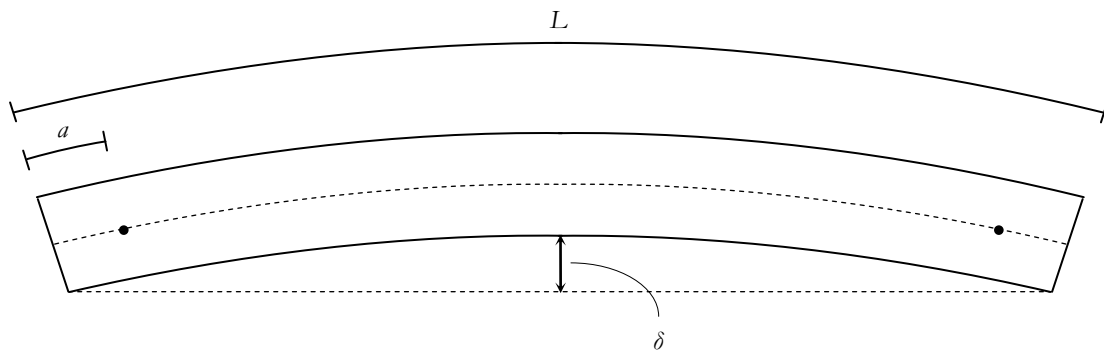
Plan view of a beam with a lateral sweep imperfection.
